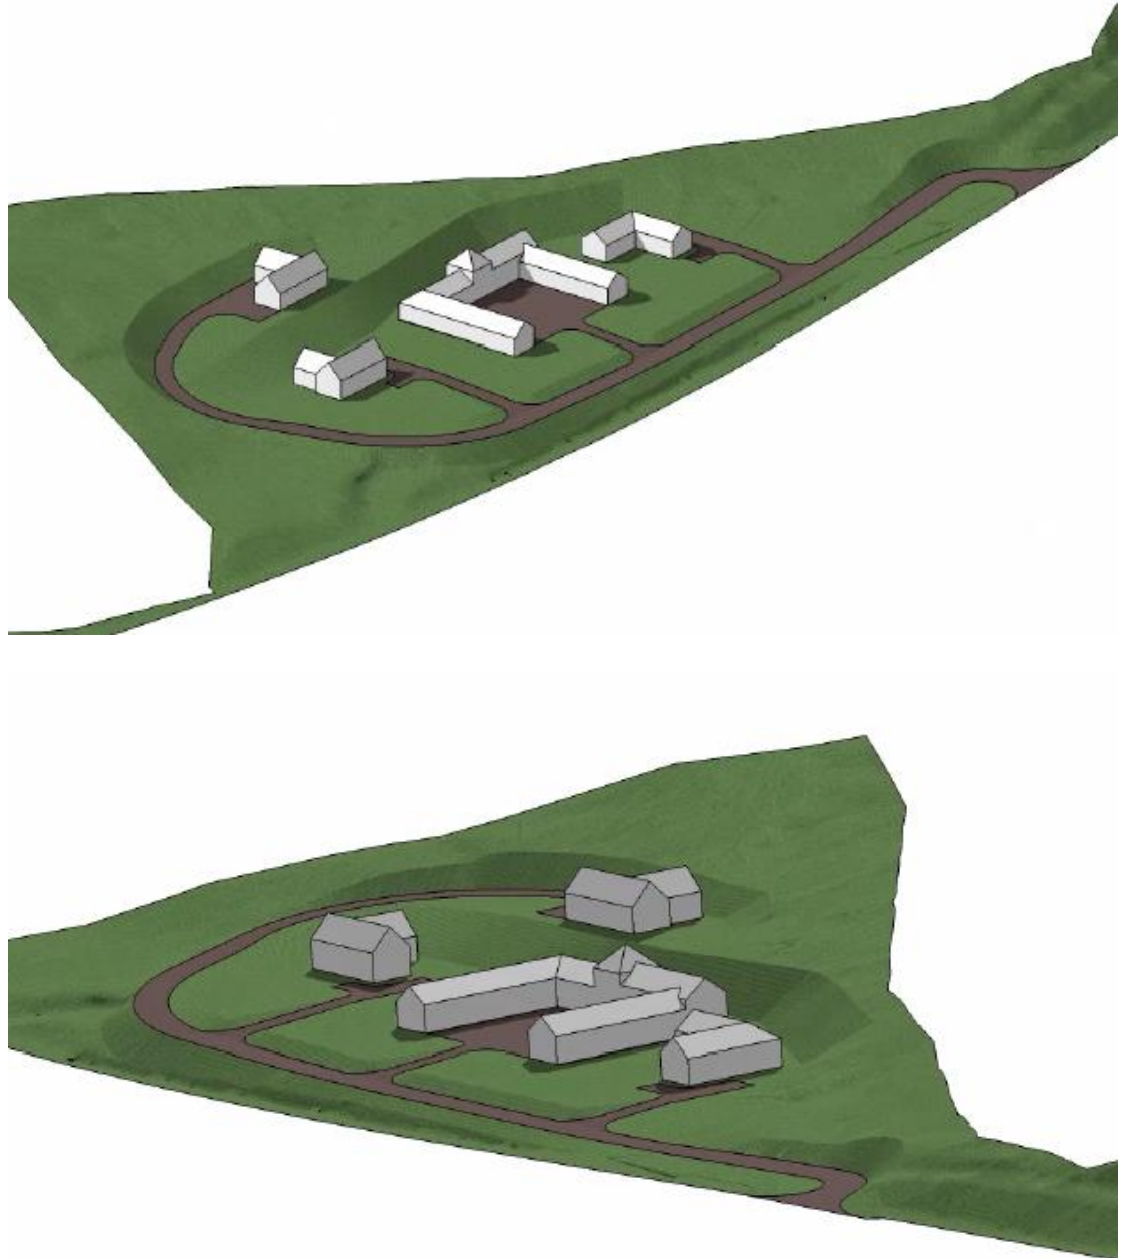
(b): Visualisation/Modelling of Potential Site Layout (extract from applicant's design statement for information only)
